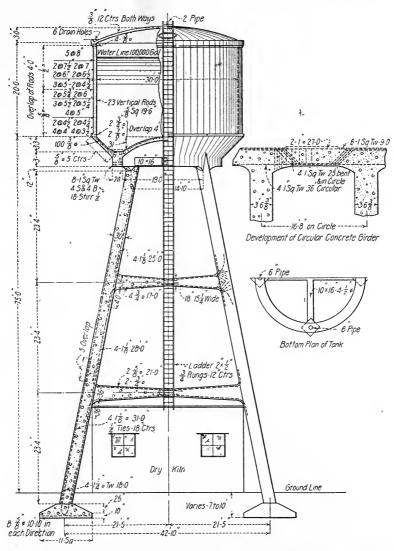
Water tank and tower of reinforced concrete. Chicago City Railway Co., Chicago, Ill.
